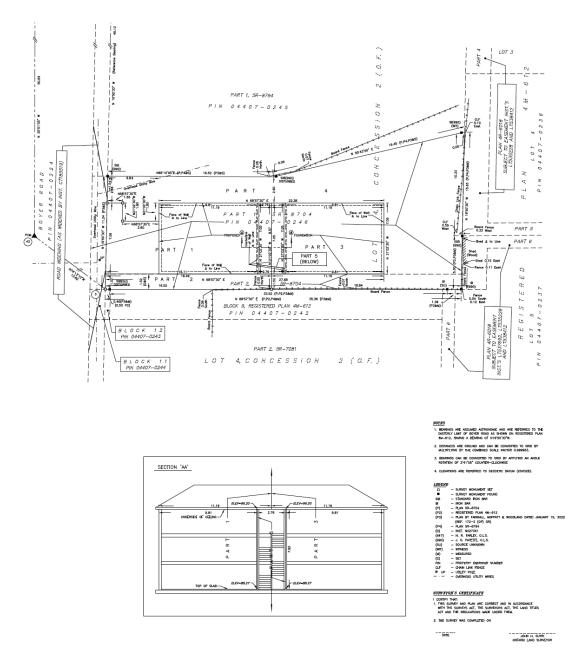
Draft R Plan (Source: Fairhall, Moffatt & Woodland, marked up by Q9 Planning + Design)
